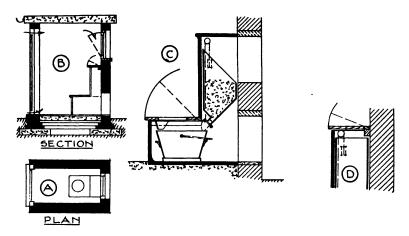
Earth closet. A and B. Plan and section of apartment. c. Section showing salt-glazed fireclay casing, and galvanized-iron pail and earth container with access from outside apartment. D. Alternative access inside apartment to earth container.
